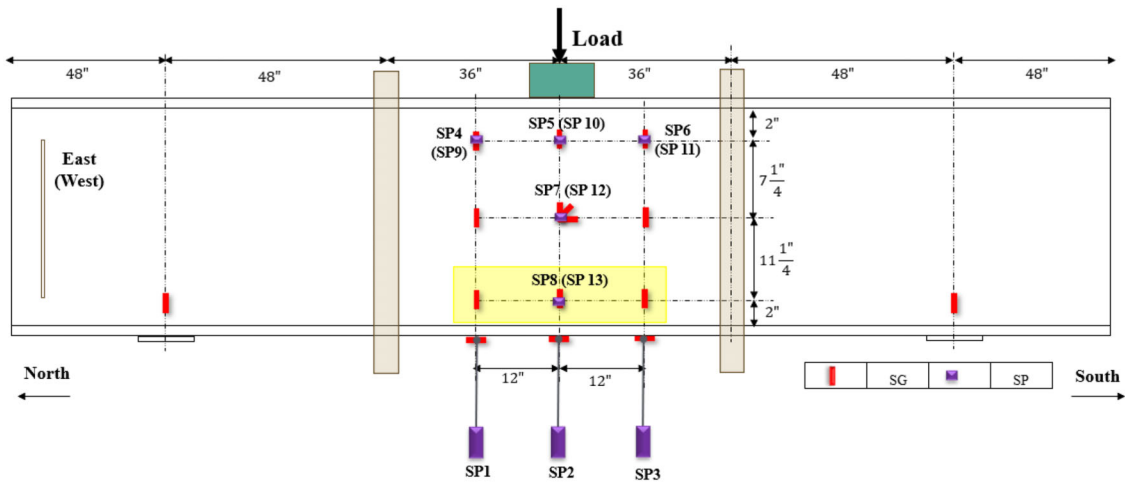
Displacement sensor layout (side elevation): Specimen 7.
